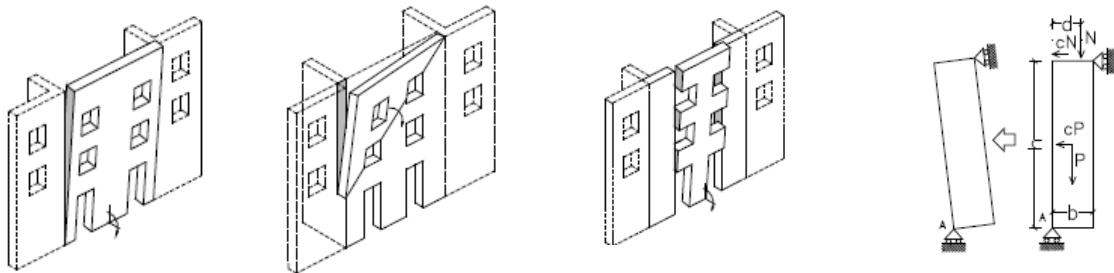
Possible mechanisms of collapse for simple overturning (D'Ayala, 2003a.). From left to right: vertical overturning, partial overturning and vertical strip overturning. The latter occurs when vertical cracks cause the detachment of a façade strip, due to the different stiffness between openings and piers. On the right, the scheme shows the overturning of a wall simply supported by the orthogonal wall
